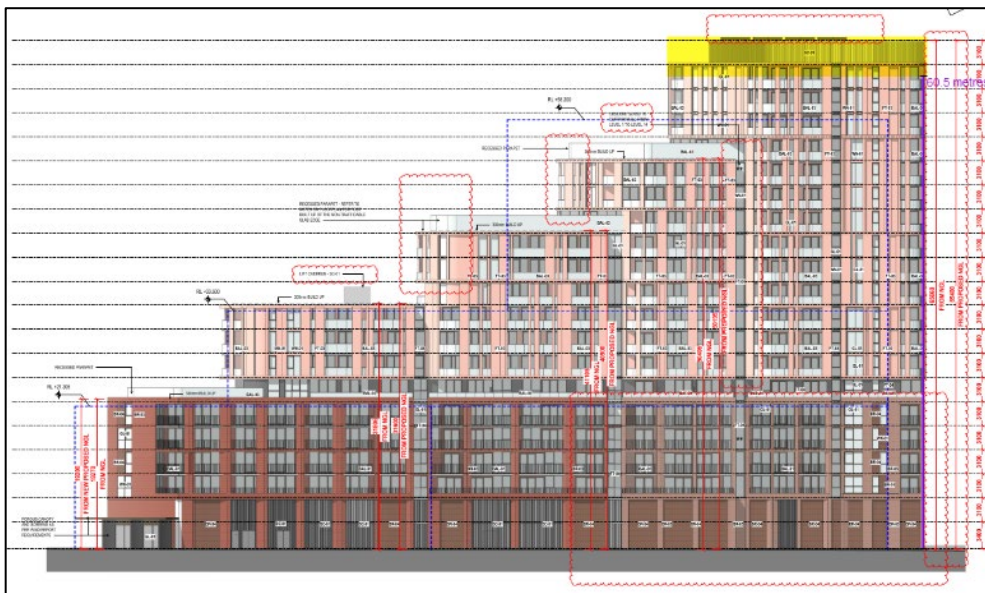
Northern elevation of Building 05 marked up to show extent of building height reduction required
